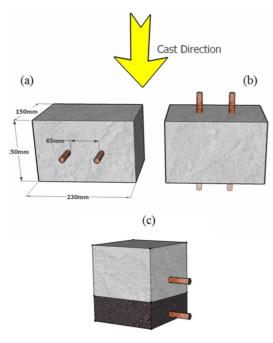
Dimensions of specimens for corrosion measurement. (a) Vertical rebar orientation. (b) Horizontal rebar orientation. (c) Specimen after sectioning of one edge to allow 10 mm between exposed face and tested rebar.
